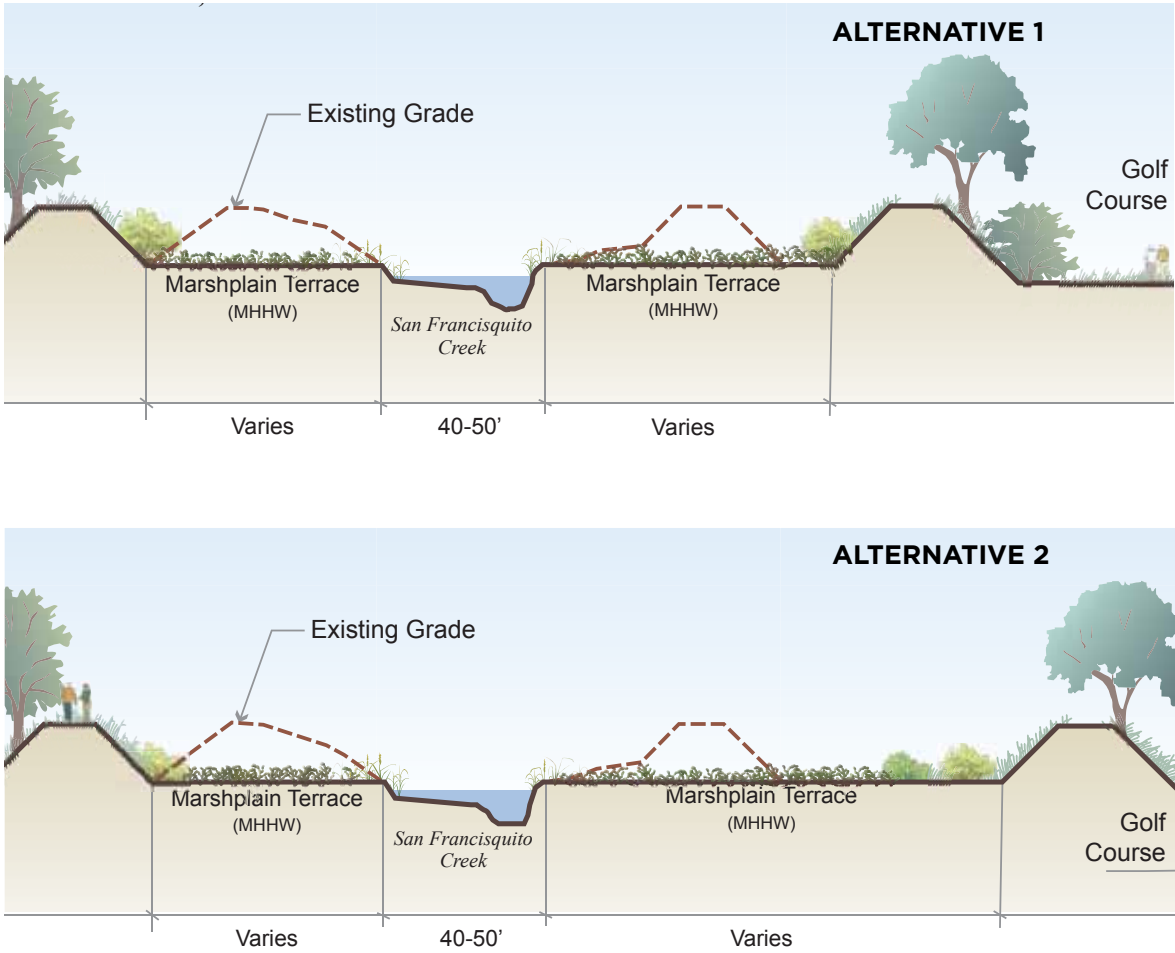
| CROSS SECTION C, VIEW LOOKING DOWNTREAM
